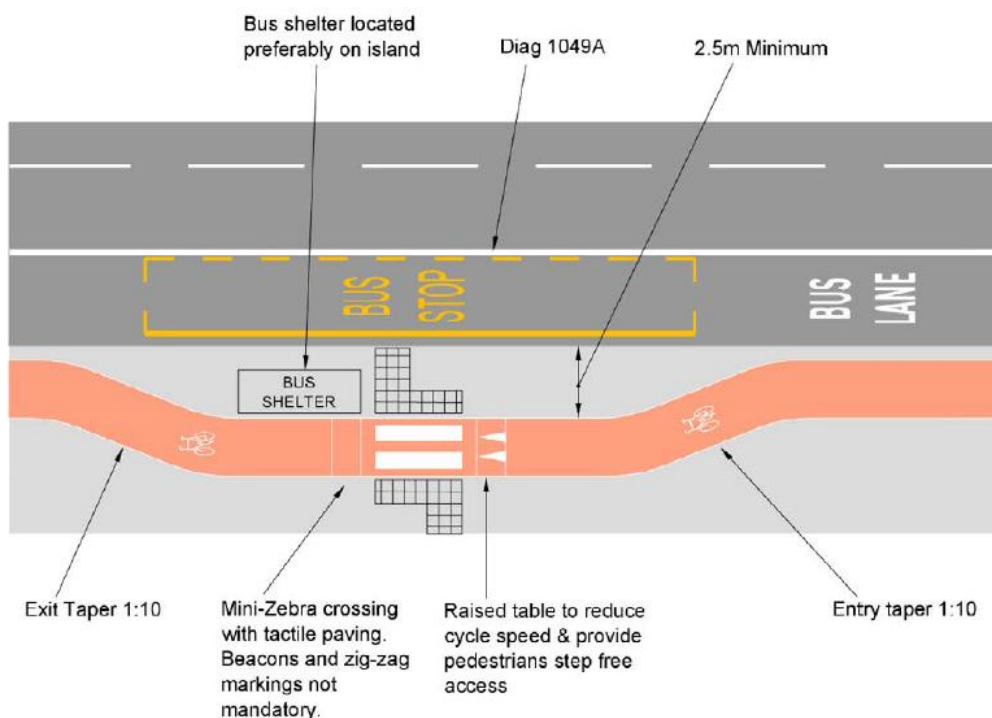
Typical Design Detail of a Bus Stop Bypass (source LTN 1/20)
